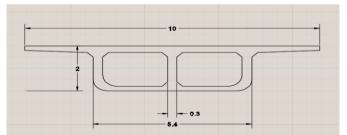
Cross-sectional details circular straight box girder (all dimensions are in meter).
